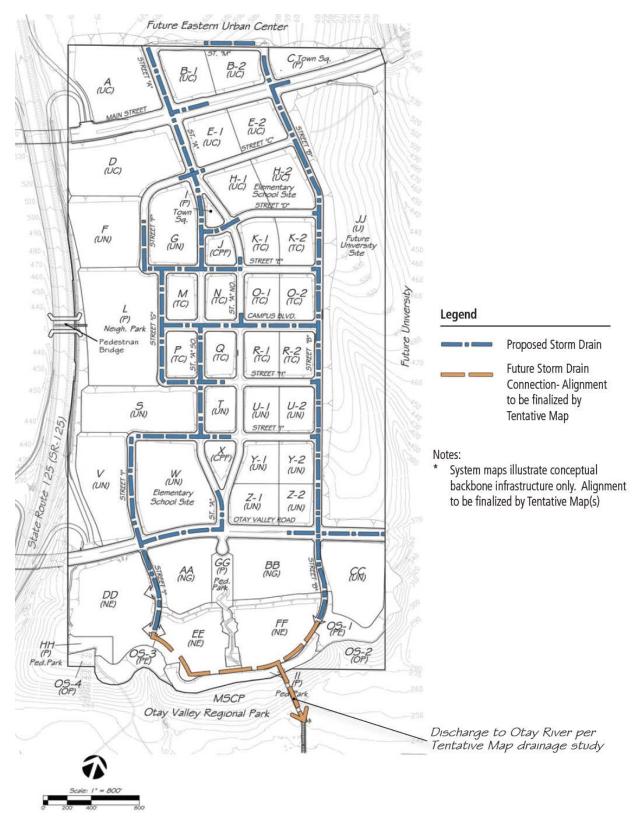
STORM DRAIN MASTER PLAN
